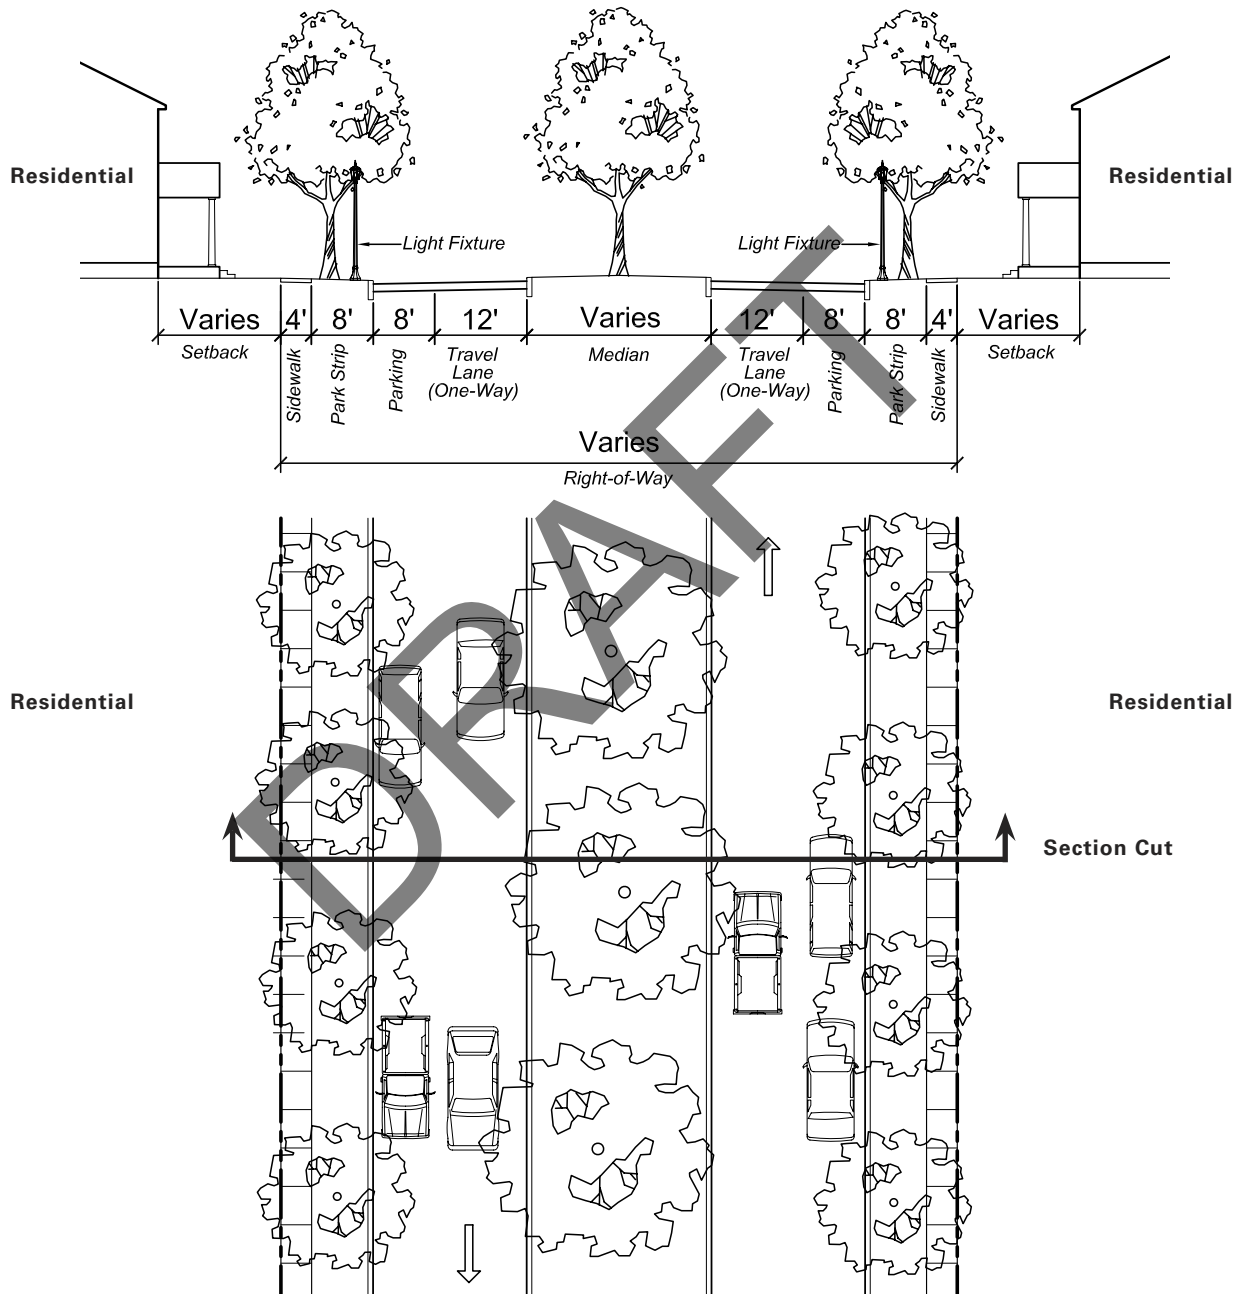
Proposed Section and Plan: Neighborhood Street D
